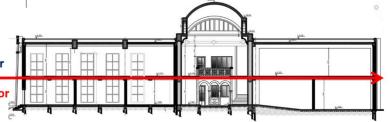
Section A-A -source: Architectural Office Khelili Abd Hafid
